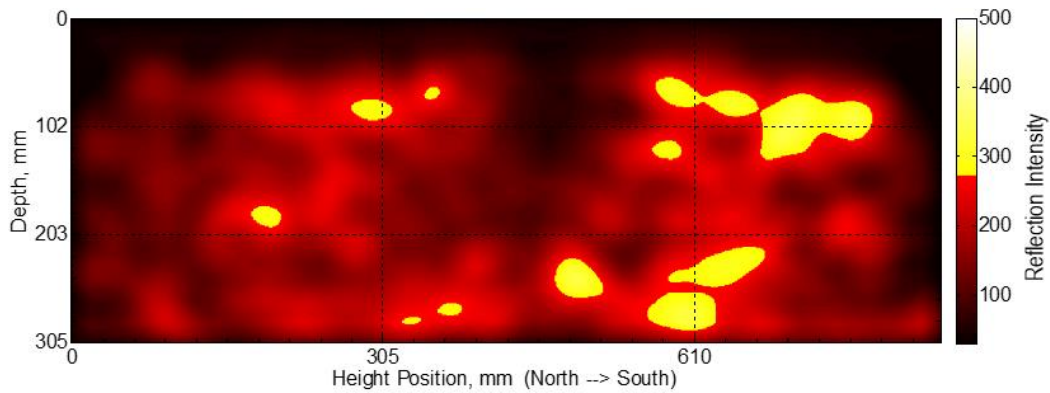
Reconstruction from the west side of slab D indicating damaged concrete condition.
